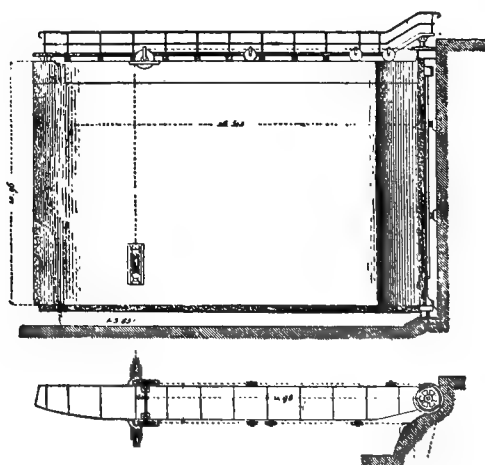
Elevation and plan of a leaf of the Belot lock gates.
